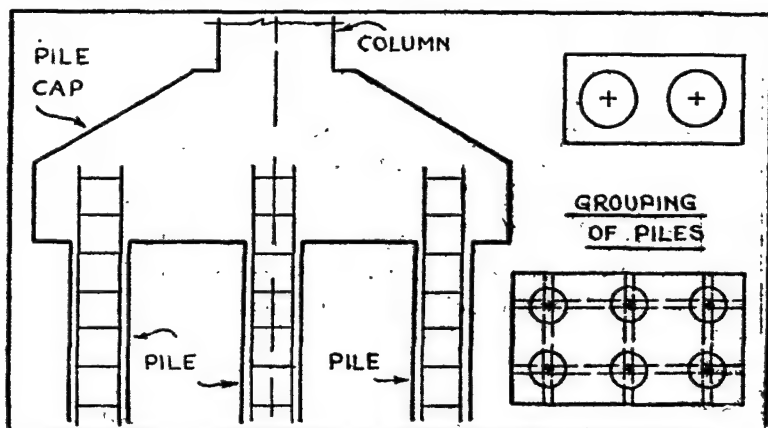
, 47 and 48. Details of grouping of Piles and pile caps
